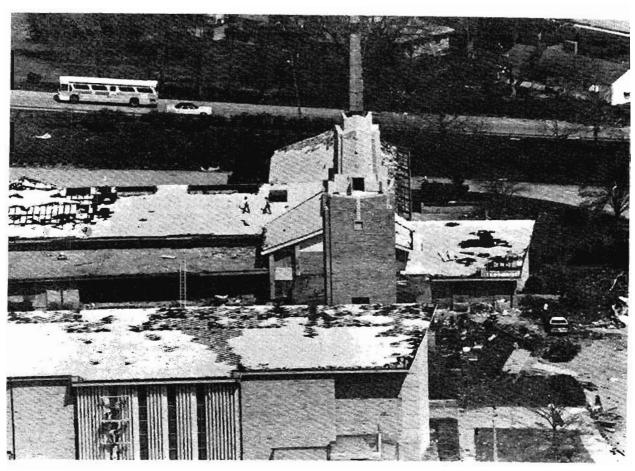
AIR FLOW OVER FULLY ENGINEERED CHURCH BUILDING CAUSED LOCAL FAILURE AT EAVES, RIDGES, CORNERS OF ROOF. Local pressures can be very large and often induce progressive failure.
